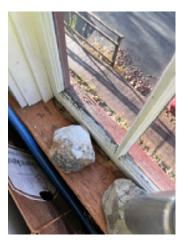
Indications of Water Damage on the Windowsill.
